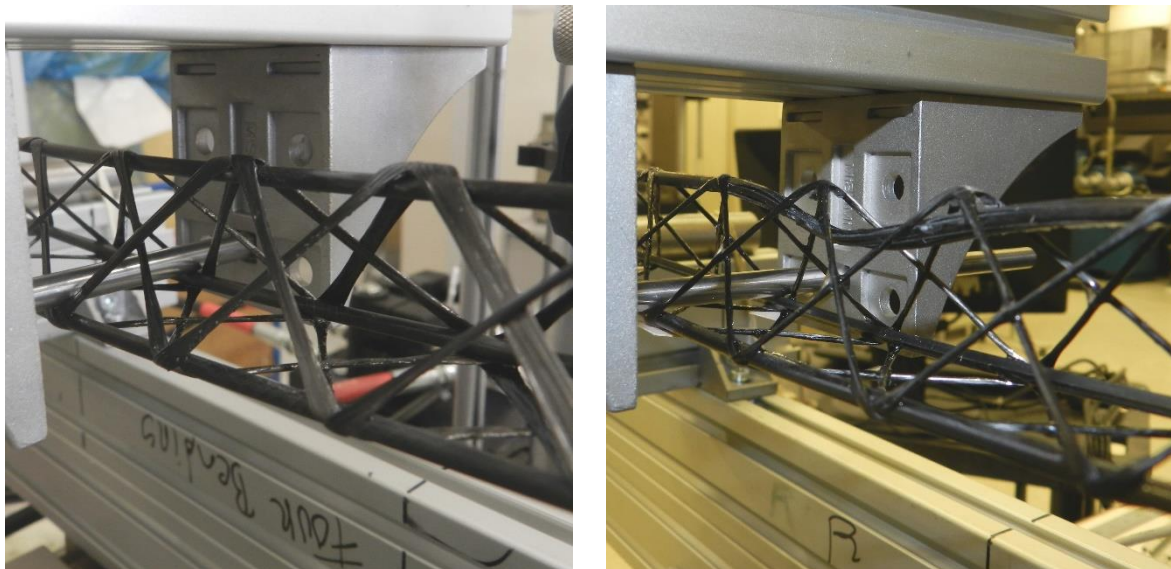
Failure in small section truss configurations: a) S-F: debonding; b) S-T: debonding and chord failure.
